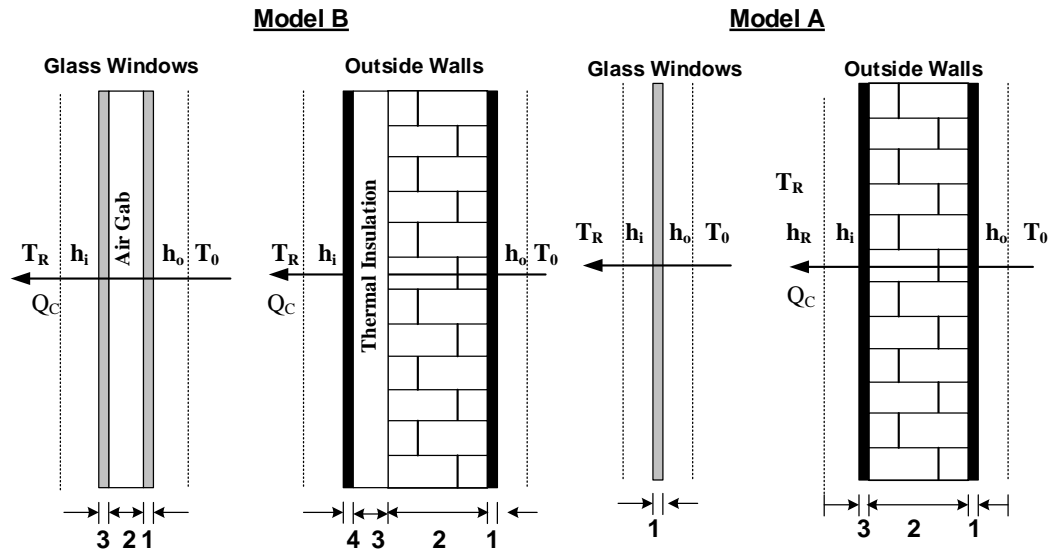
Building Models A and B with common construction materials and thermal insulation.
